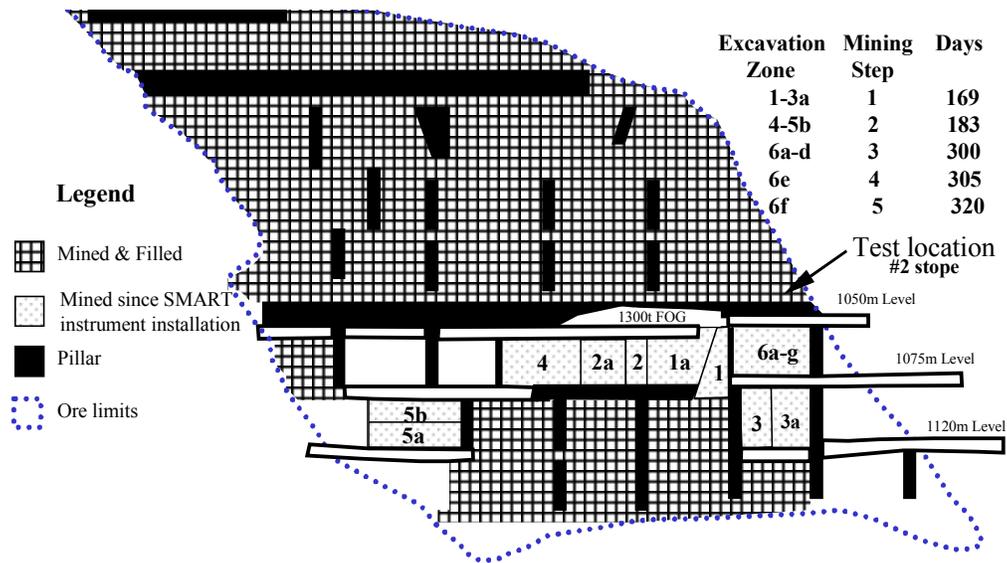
4: Longitudinal section of the Callinan East Zone showing the excavation zones in the mining sequence.
